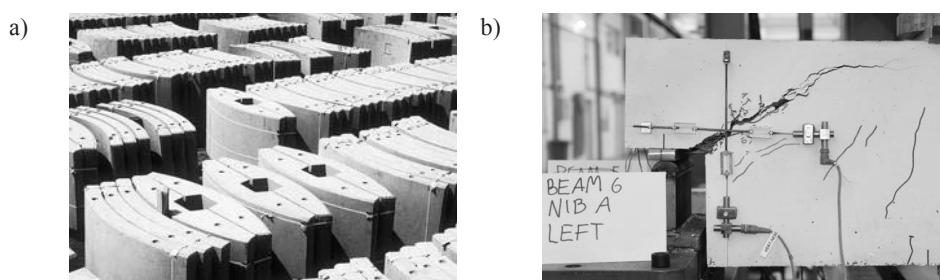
Examples of applications of steel FRC: a) industrial manufacture of precast tunnel segments¹, and b) investigation on the use of FRC in dapped-end beams to simplify the highly congested traditional reinforcement layout (Nedrelid and Kanstad, 2014a).
